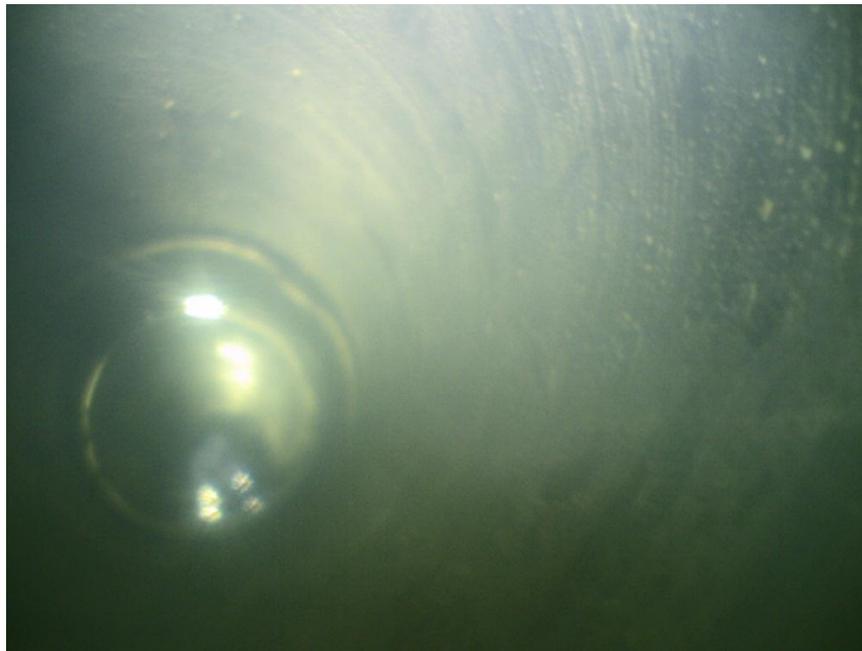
void between pier concrete and bedrock and highly weathered rock pieces
